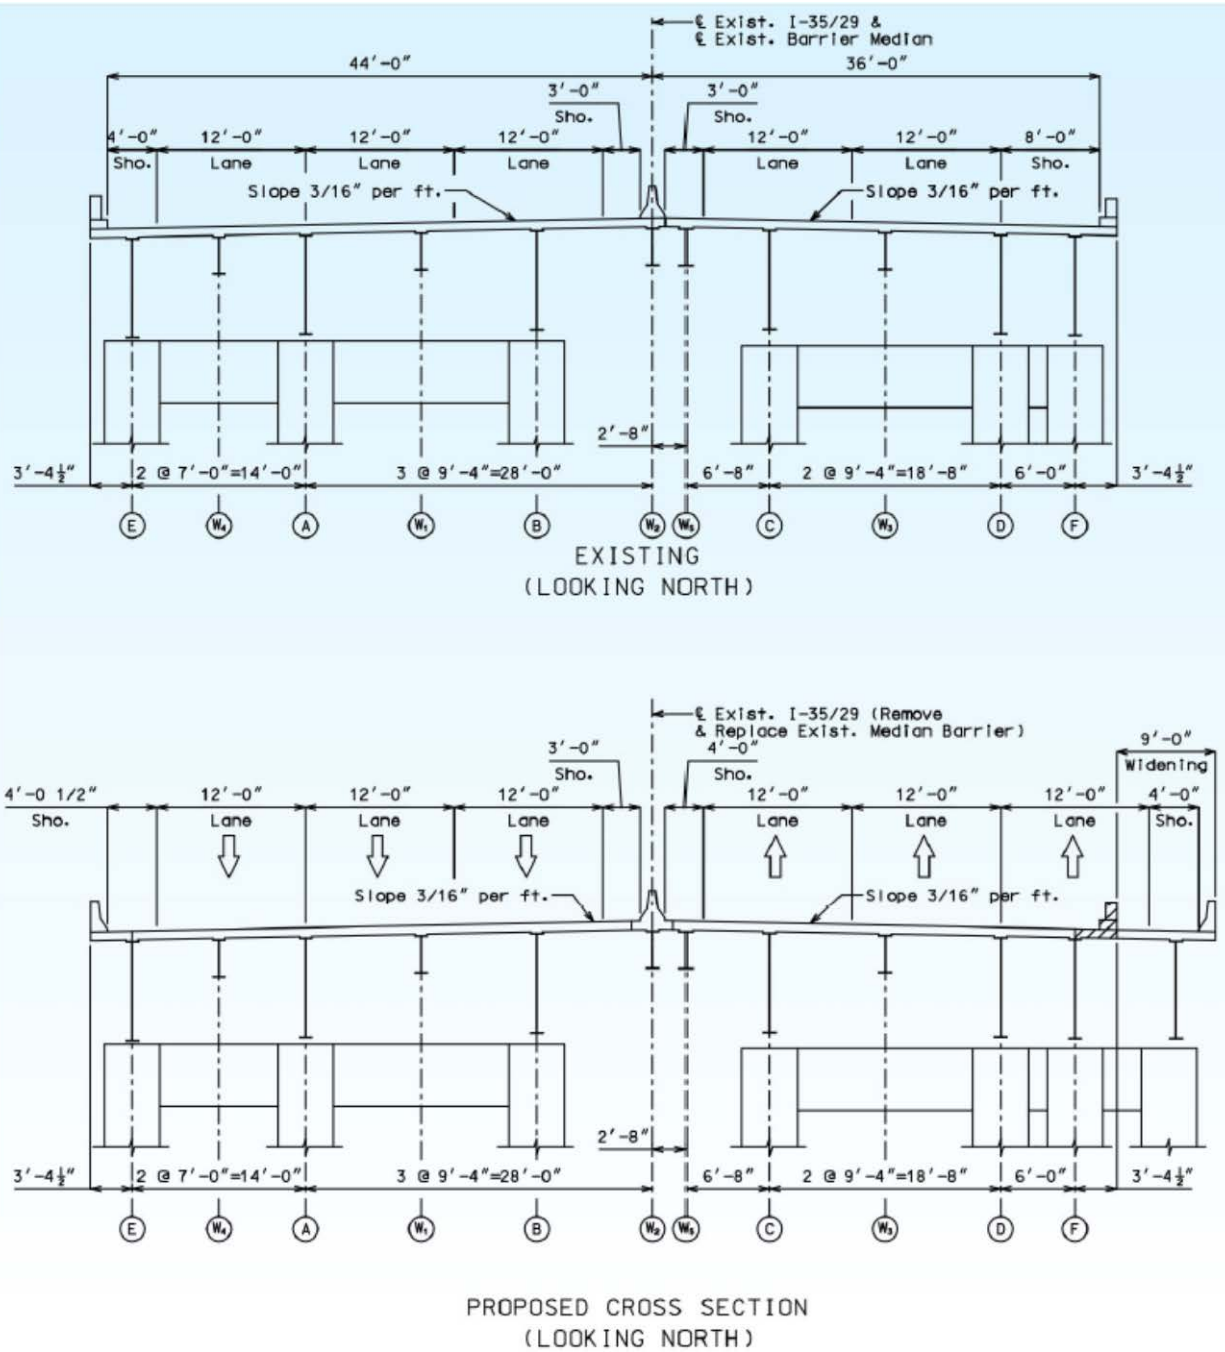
Existing and proposed typical cross section of I-29/35 north railroad viaduct.
